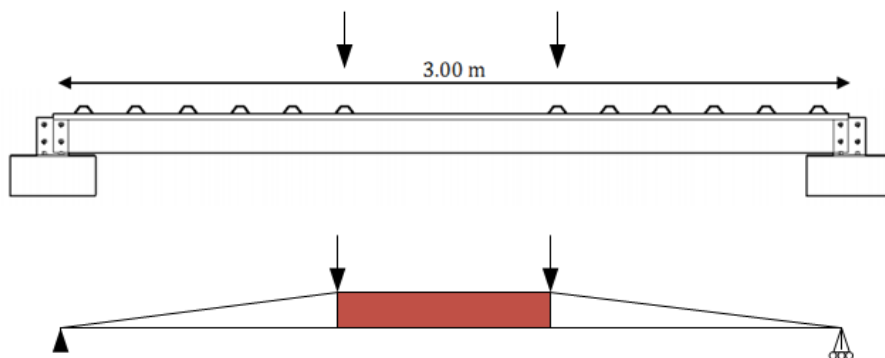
Elevation view and bending moment diagram of the test arrangement
